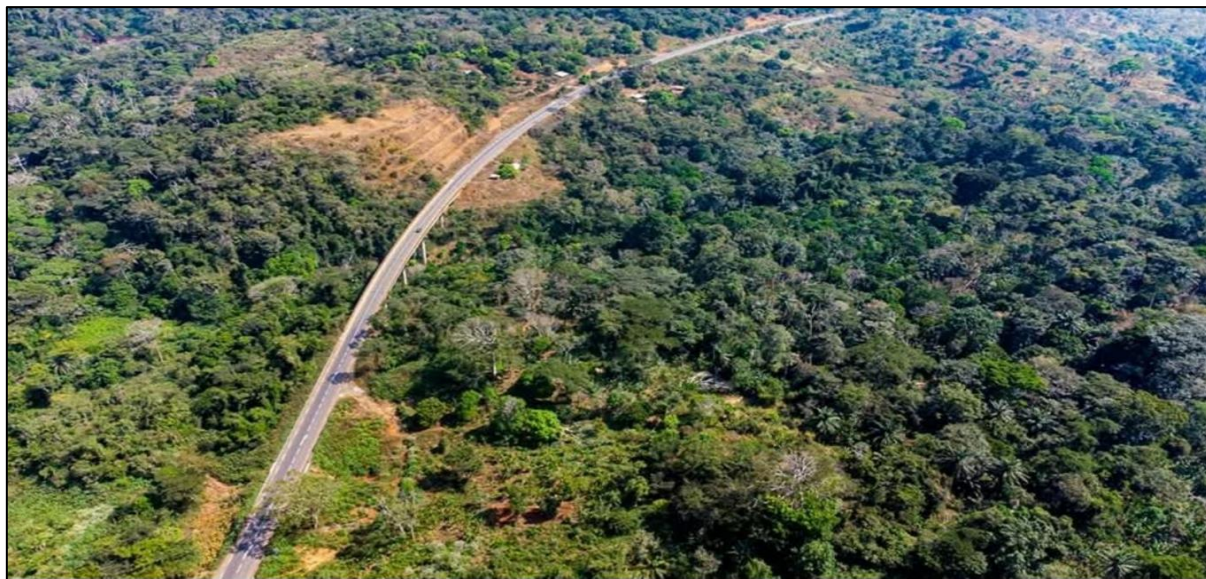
Aerial View of the Bridge Over the Bantoum River.
